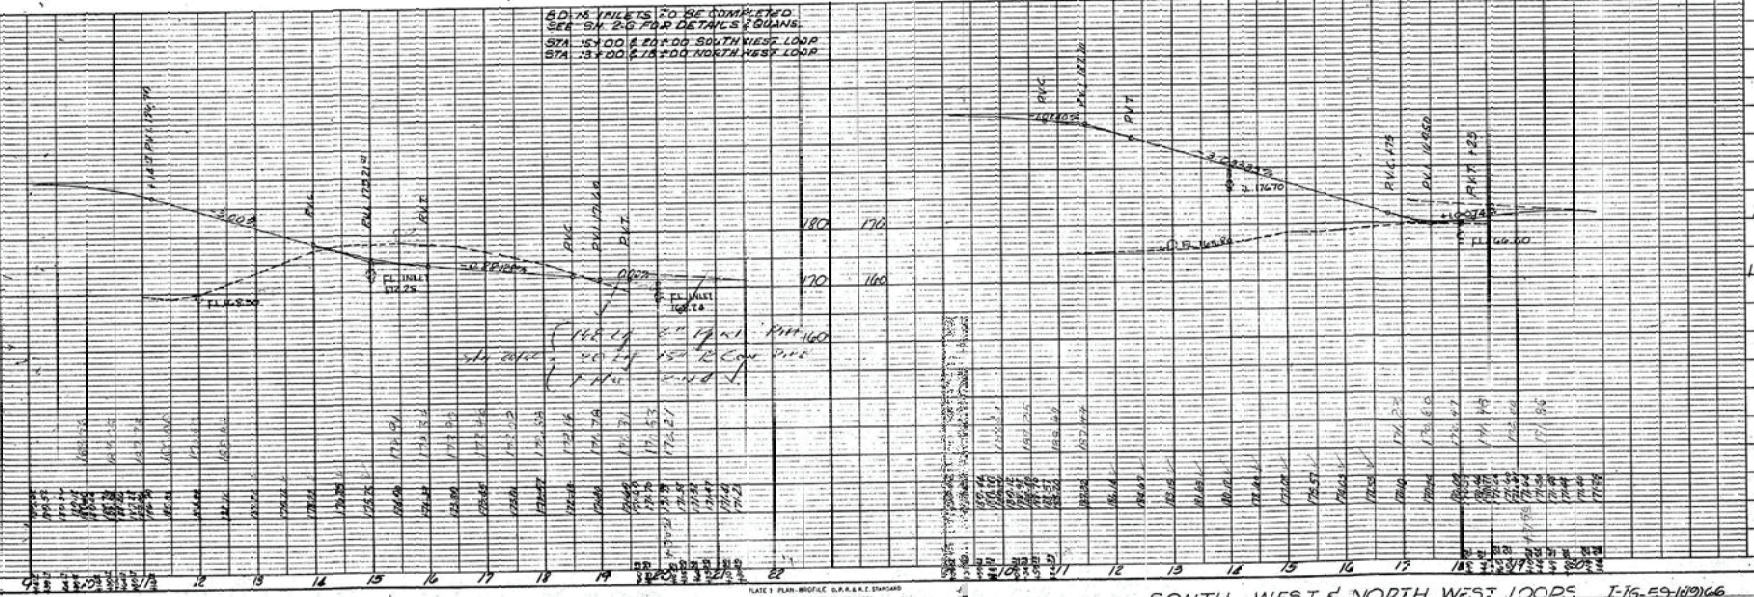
PLAN, PROFILE, D.P.A. & FINISHED GRADES & ELEVATIONS, NEW YORK
